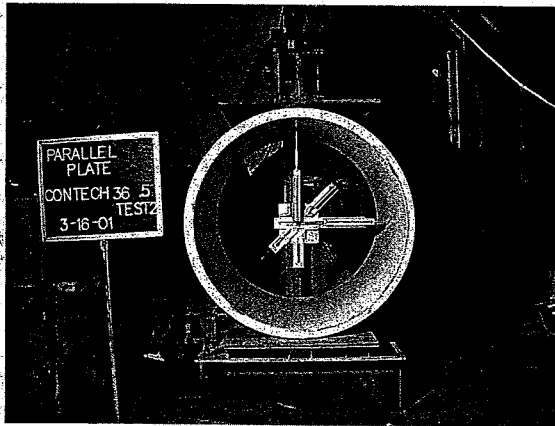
Views of ADS 36 Pipe Specimen During Parallel Plate Test
